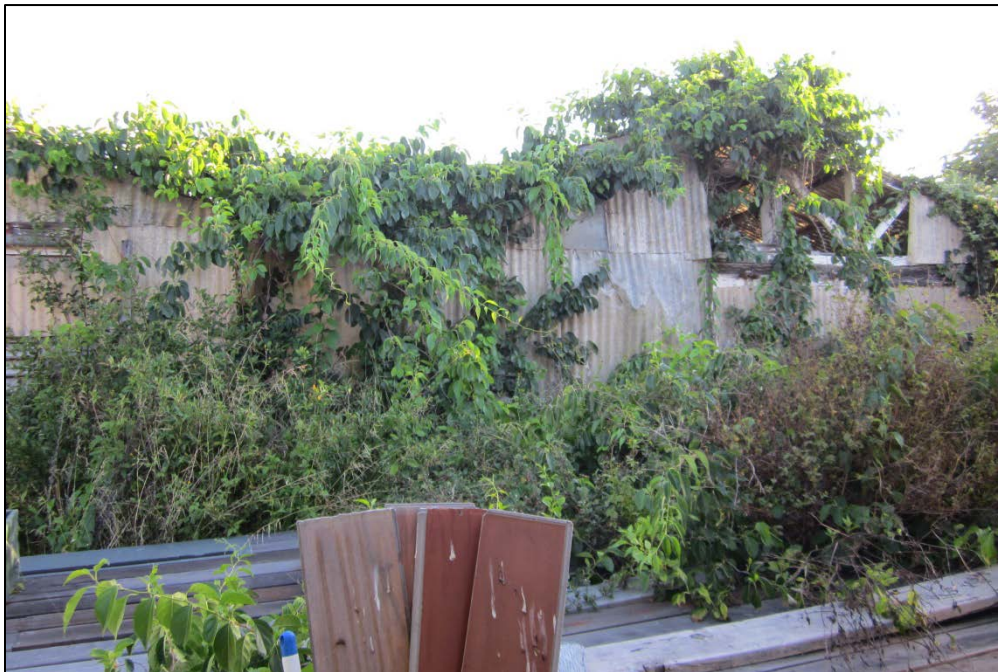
Large Shed (1343 W. 141st Street), south elevation
